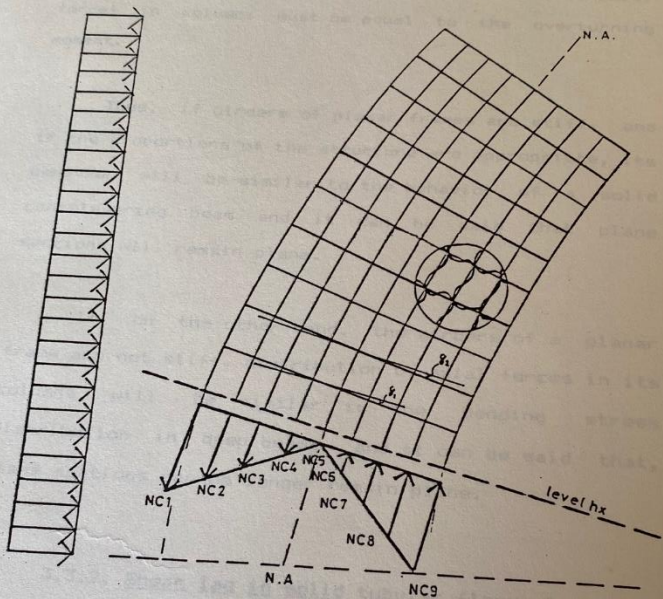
Deflection of girders of a planar frame and axial forces in its columns if girders are stiff.
